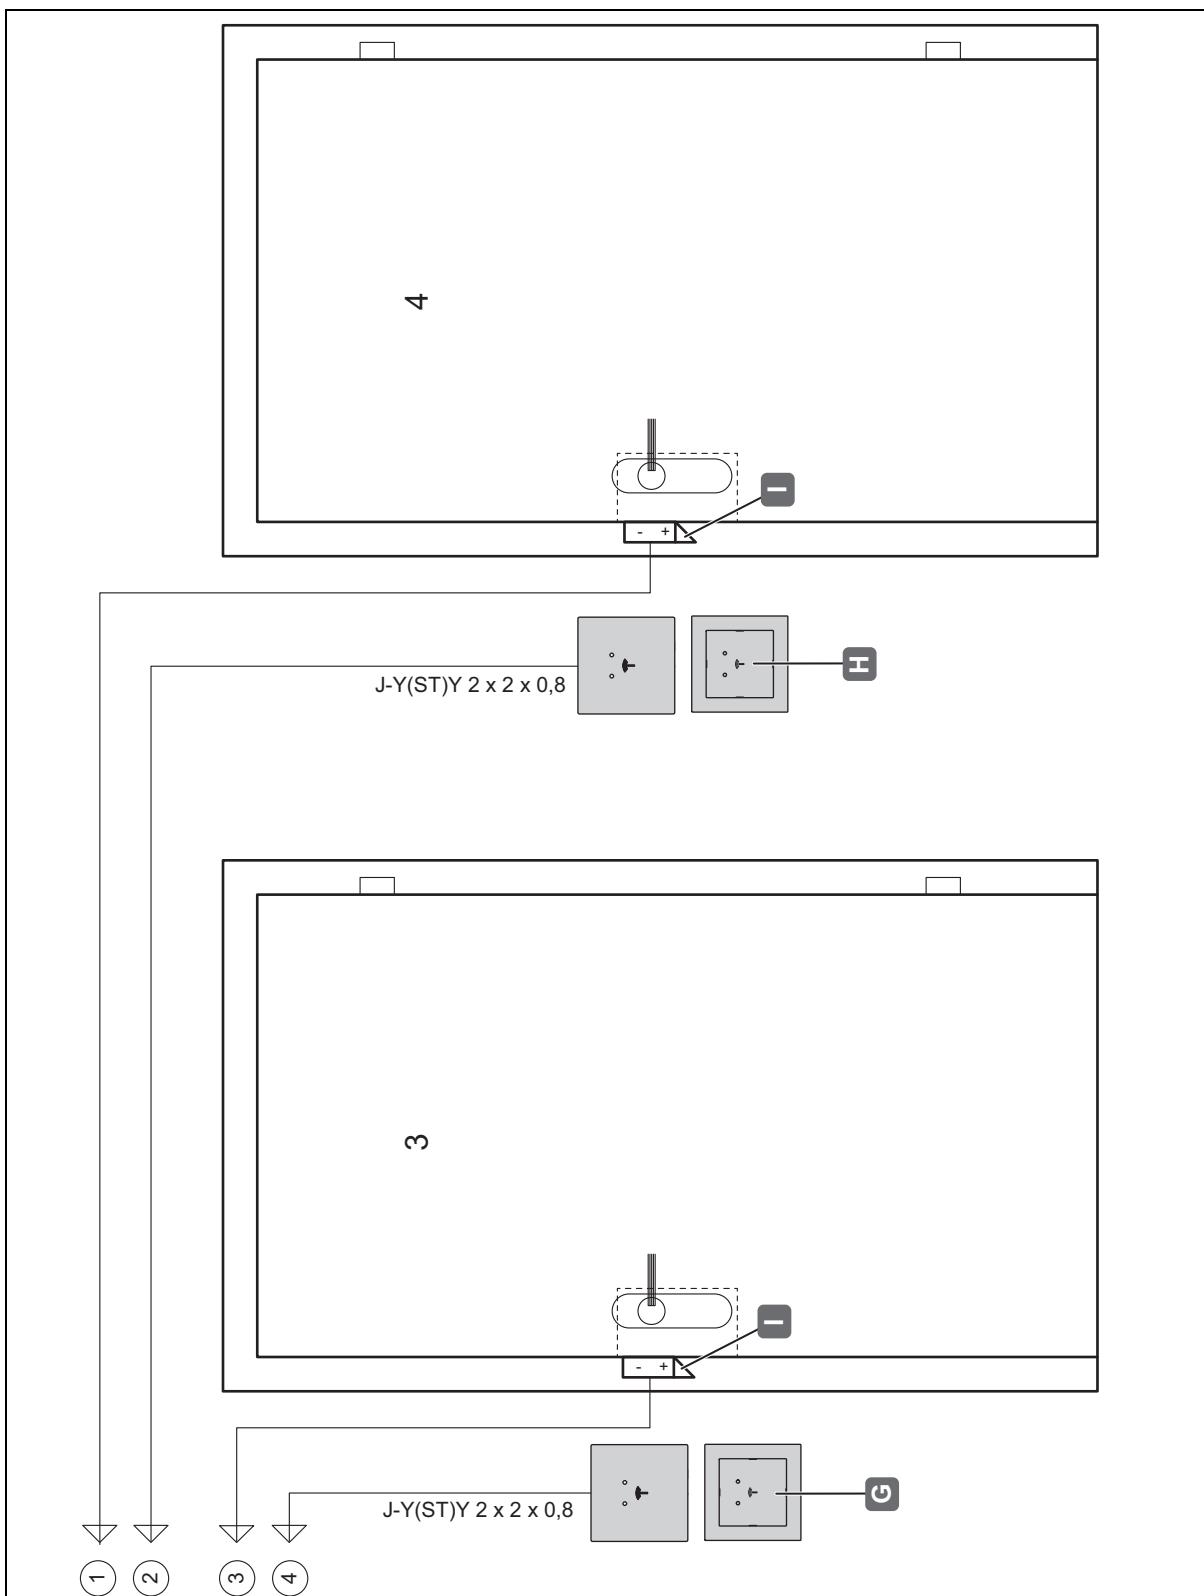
Installation example 5 - part 2 - four doors with one reader / electric strike and one controller each (including extension board)
